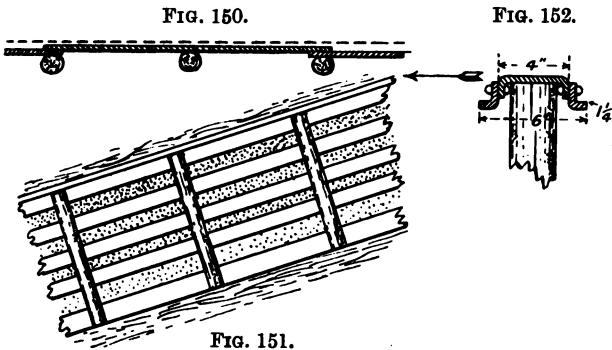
, Plan. FIG. 151, Elevation showing Arrangement of Brattice for Purposes of Hydraulic Stowage. FIG. 152, Arrangement of Props.
